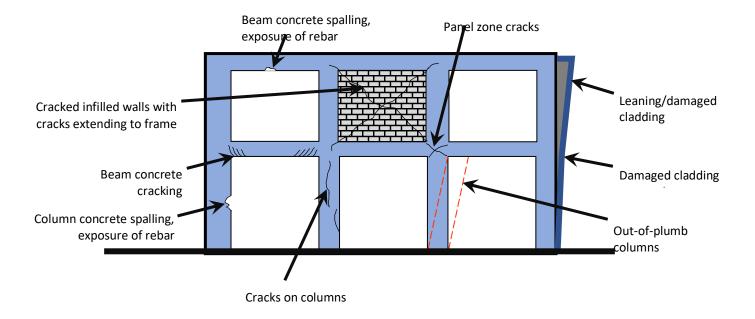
Inspection points on reinforced concrete moment-framed structures
